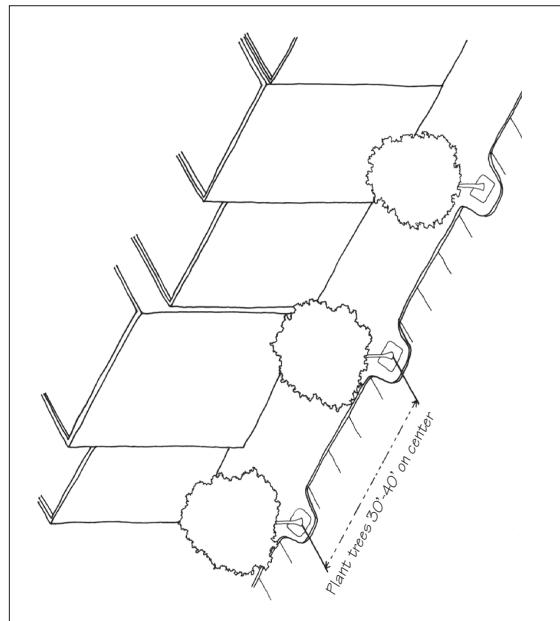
On narrow streets with parking, place tree boxes in bump outs and forgo the landscaping and pedestrian amenity strip.
